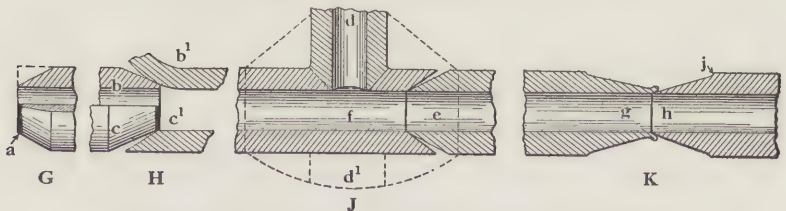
PREPARING SUPPLY PIPE ENDS FOR WIPED JOINTS
